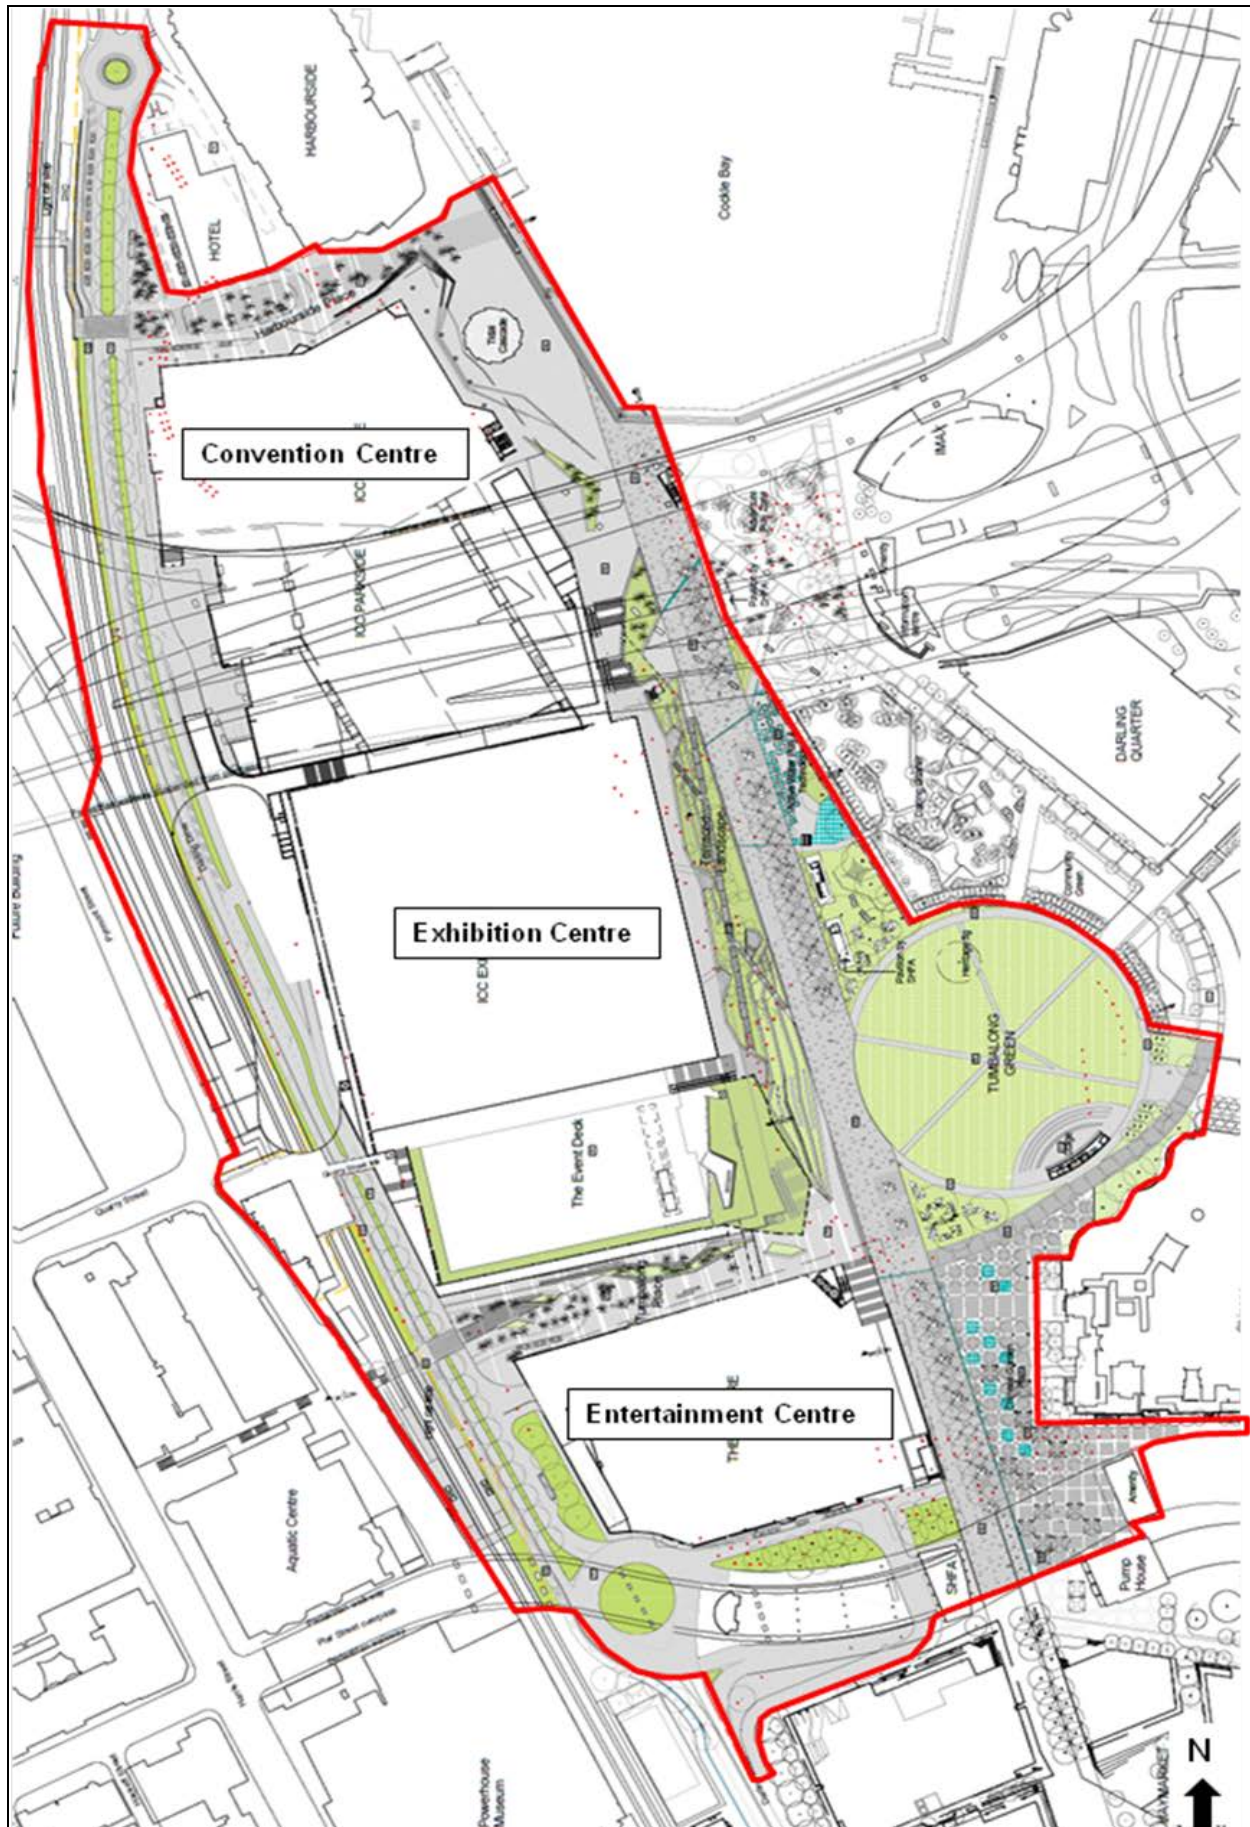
Core Facilities approved building layout and public domain (Source: Assessment report SSD 5752)
